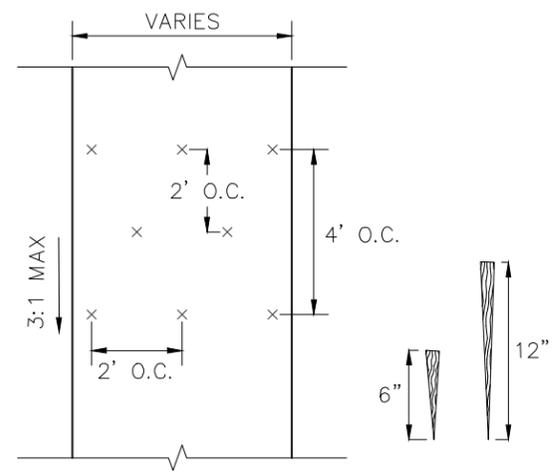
FIGURE C: TOP STAKE SPACING PLAN VIEW - NTS
